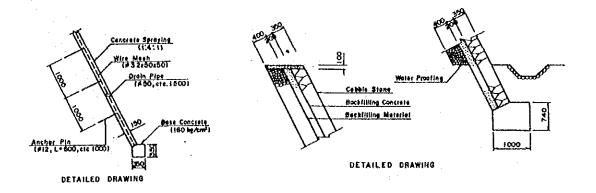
(1) Concrete Spraying (Type 1)
